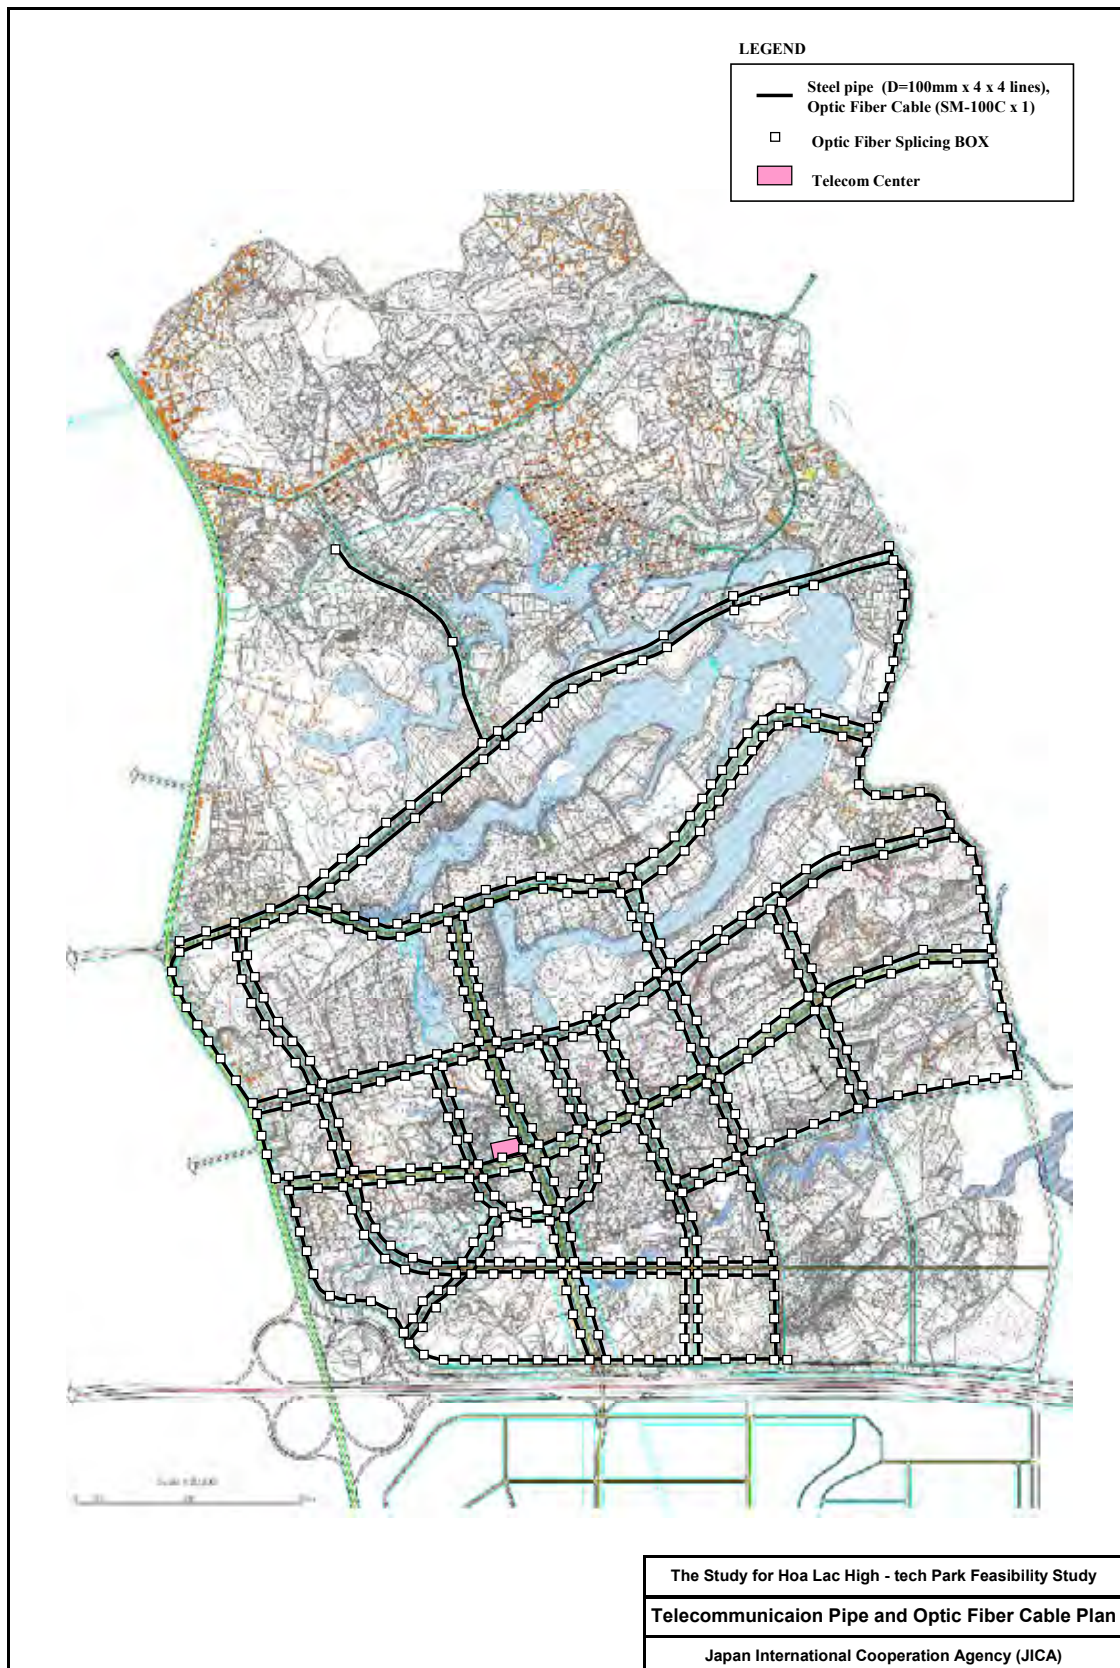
Typical Installation Plan of Telecommunication Pipe
